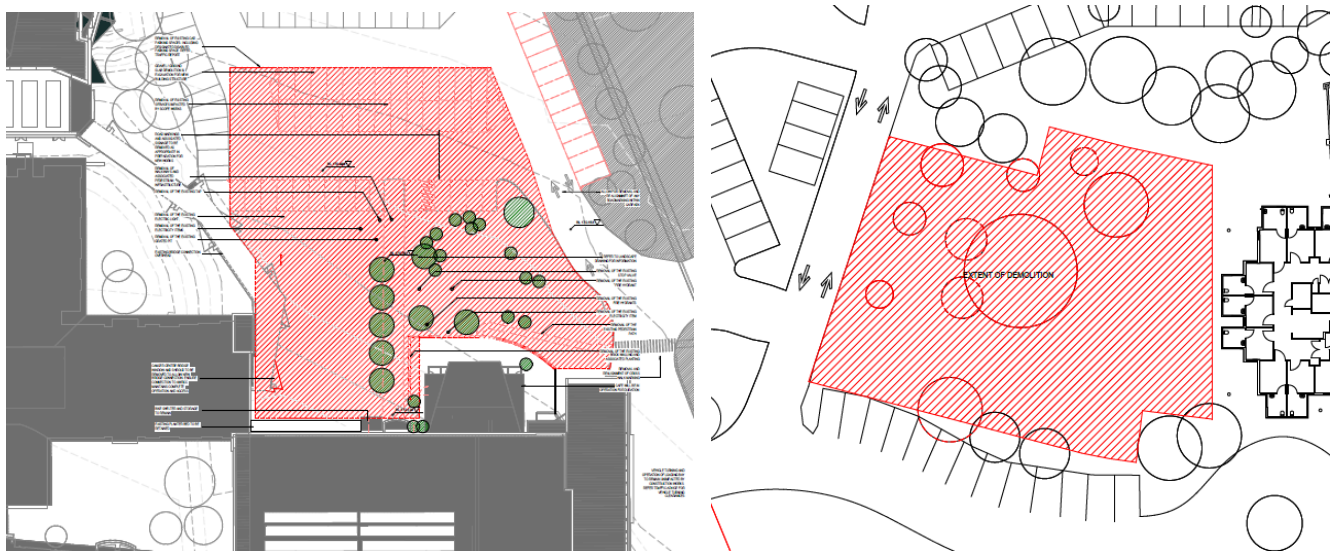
Proposed demolition works for the new Northeast Building (left) and new At-grade Temporary Car Park (right)
